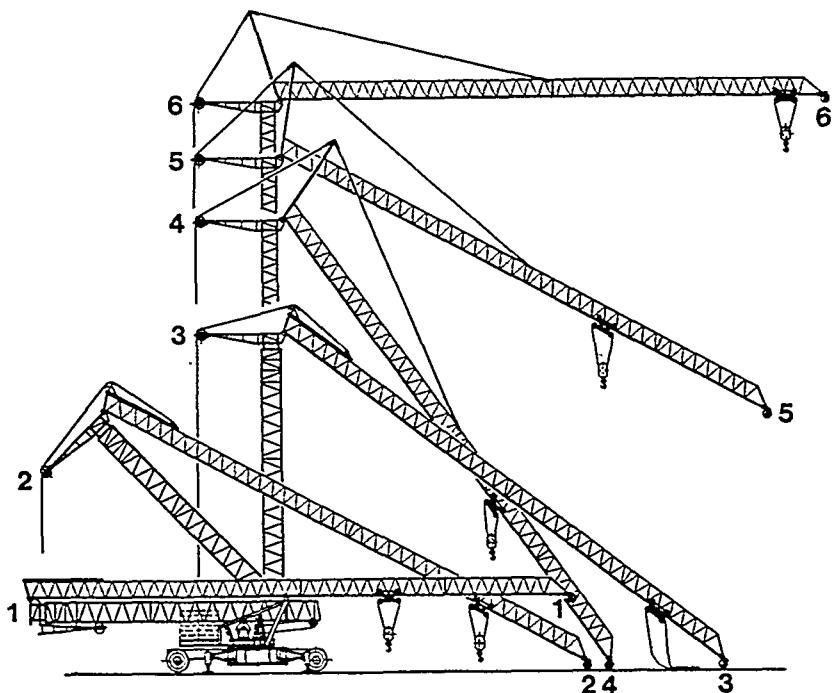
Erection (or dismantling) of a typical "fast tower" crane
